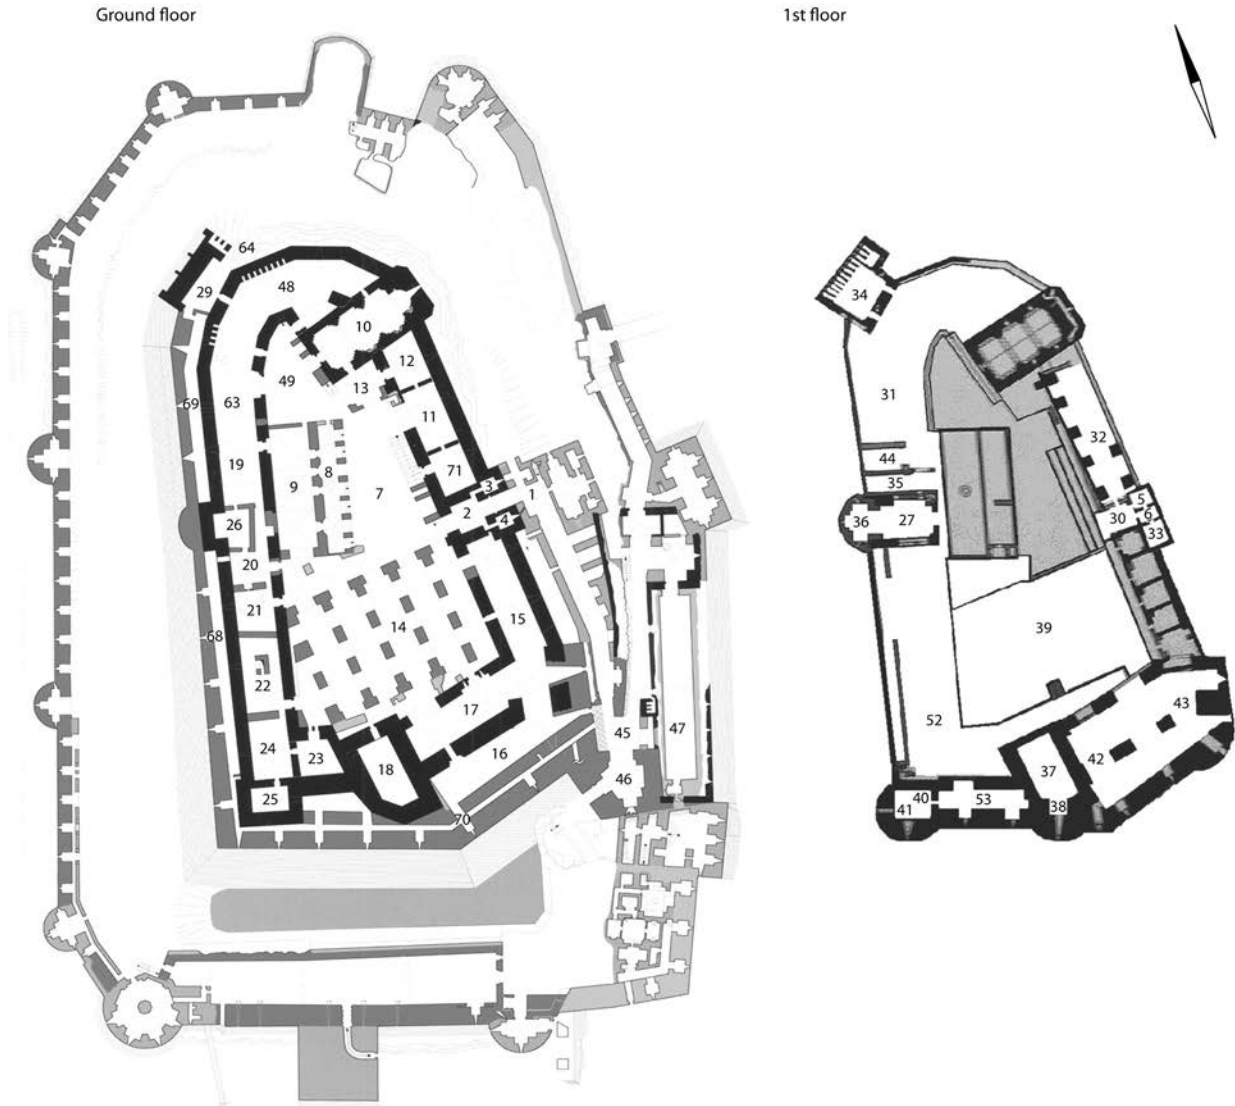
Plan of Crac des Chevaliers after the rebuilding in 1250. Created after plan of Biller 2006.
